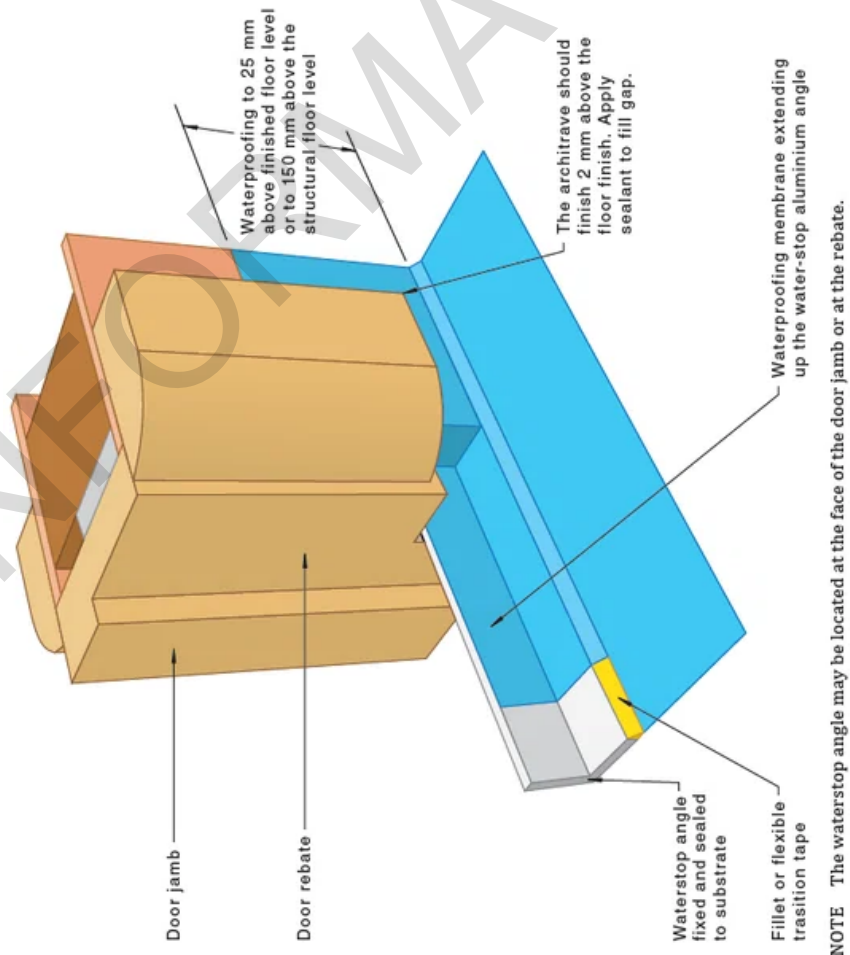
(A) — Example of liquid waterproofing at door opening framework
